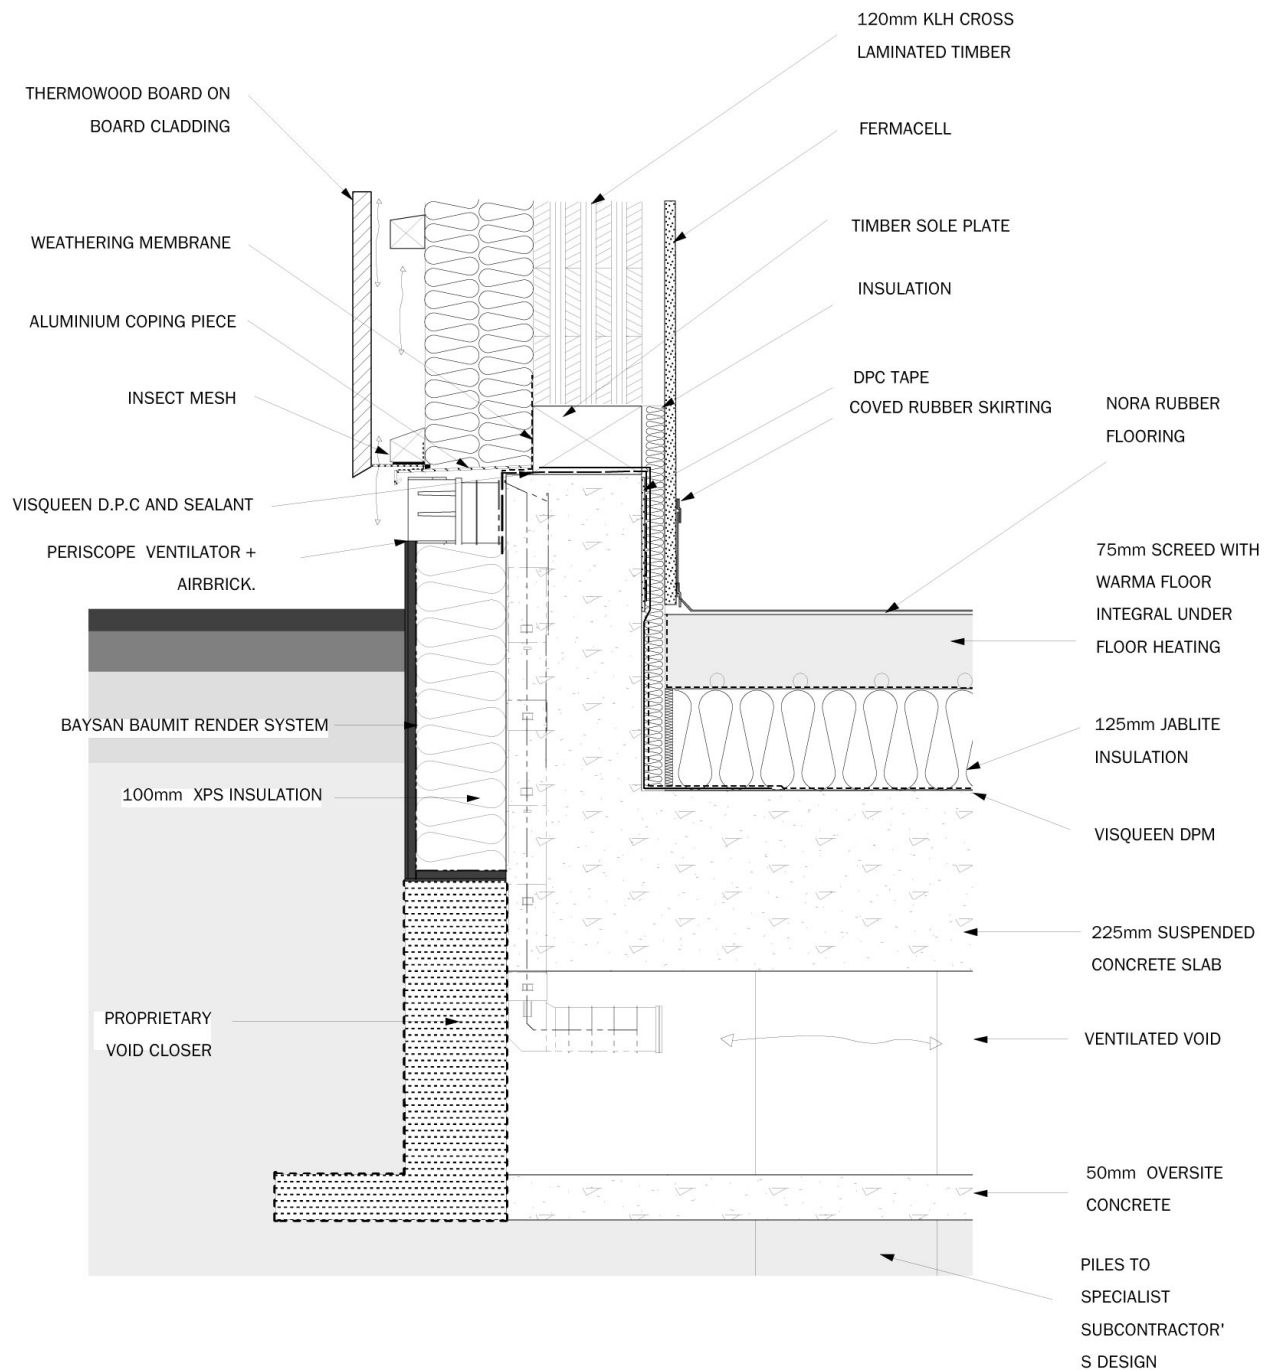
Typical Ground Floor Construction Detail – Showing the lime rendered plinth, timber cladding, wood fibre insulation, cross-laminated structure and under floor heating in the screed.
